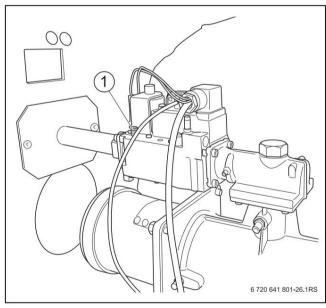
Measuring the gas connection flow pressure (boiler size 120 kW)
